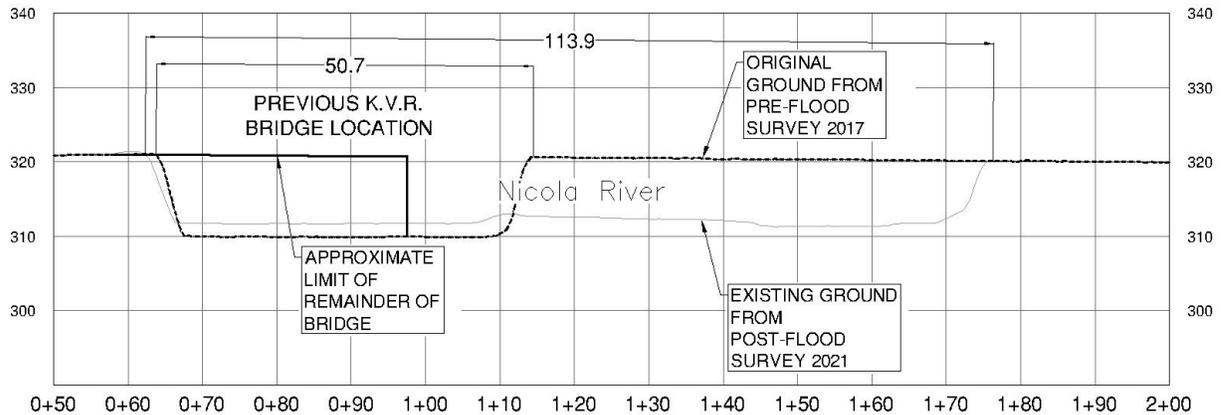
Highway 8 – Site 10 Section Through KVR Bridge
